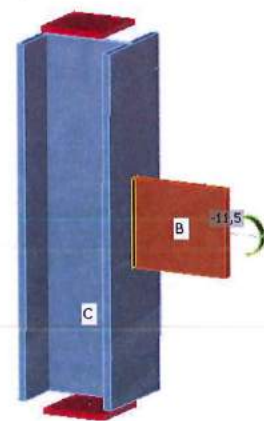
Benchmark example for the welded fin plate joint
